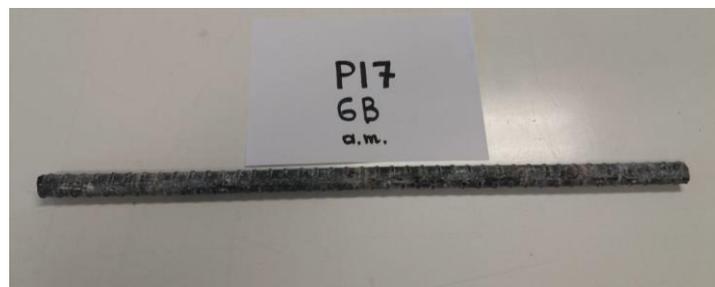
Smooth steel bar collected in one RC column used to tensile test.
